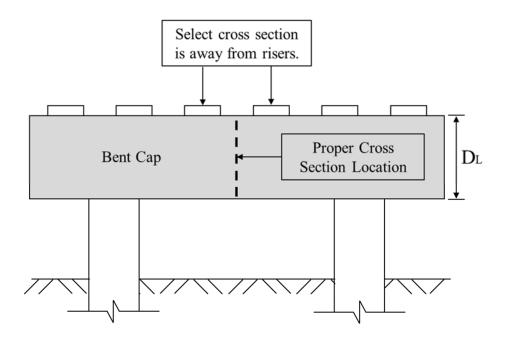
Proper cross section location on bent cap (D_L = least dimension) (n.t.s.)
